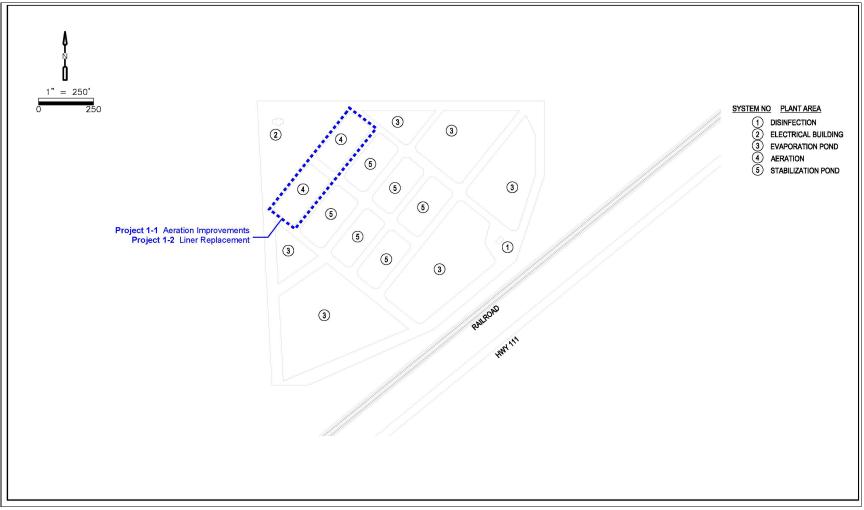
WRP 1 Existing Site Plan and Proposed Improvements
